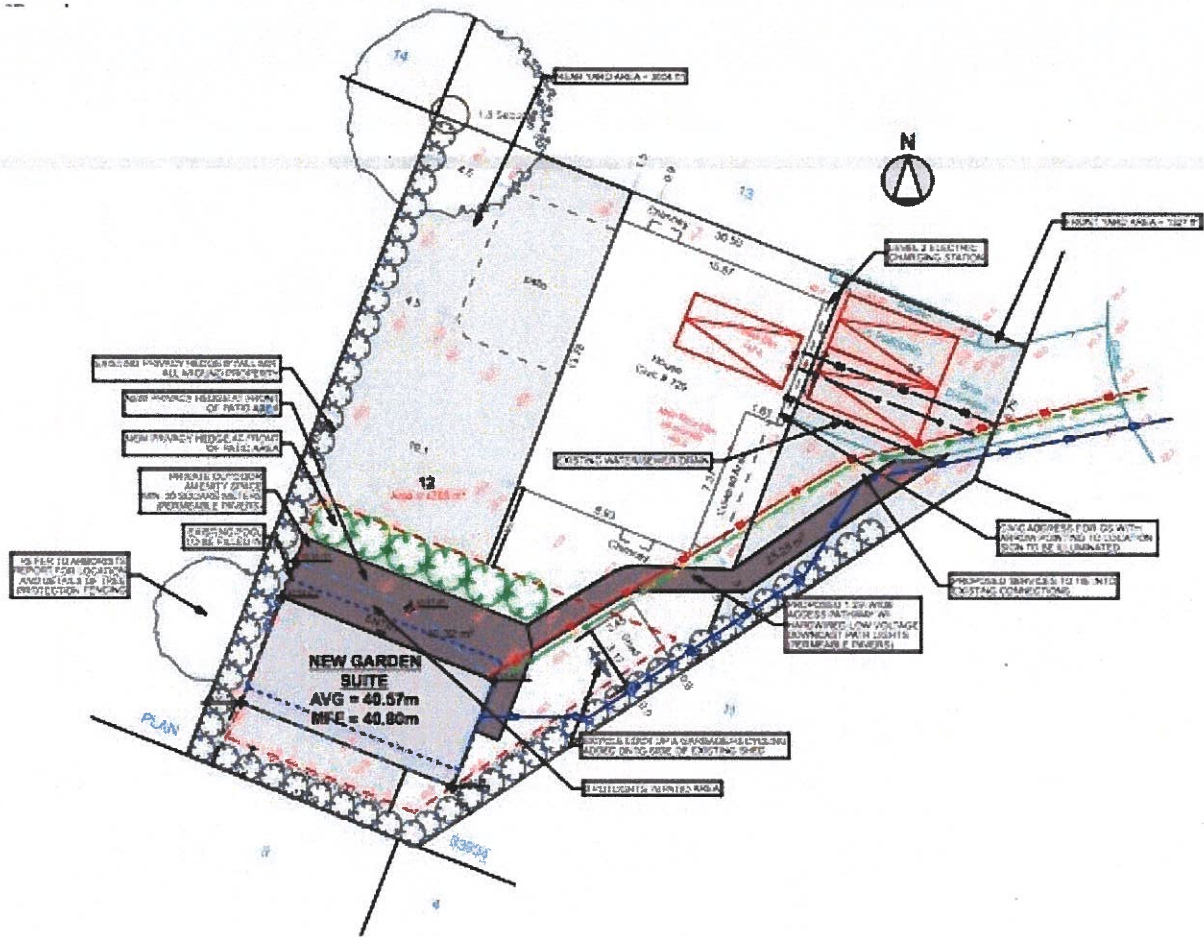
Proposed Site Plan (from plans by Adapt Design)
